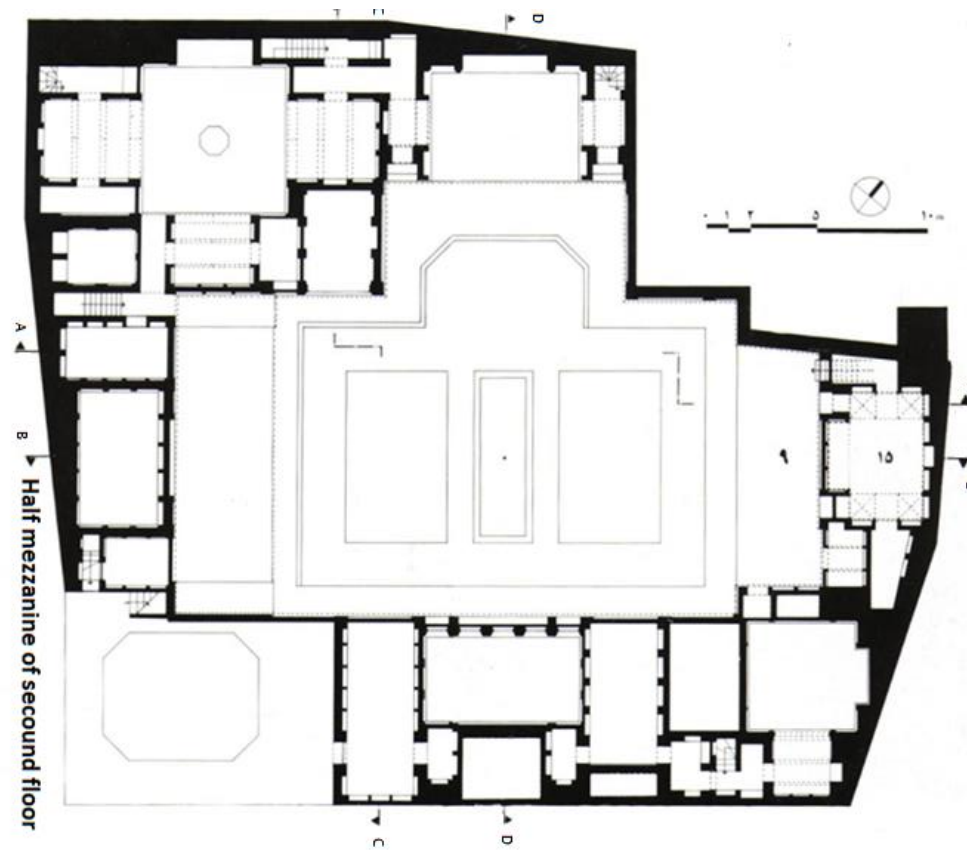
Abbasi House (Half mezzanine of Second floor) Kashan (URL 17)
